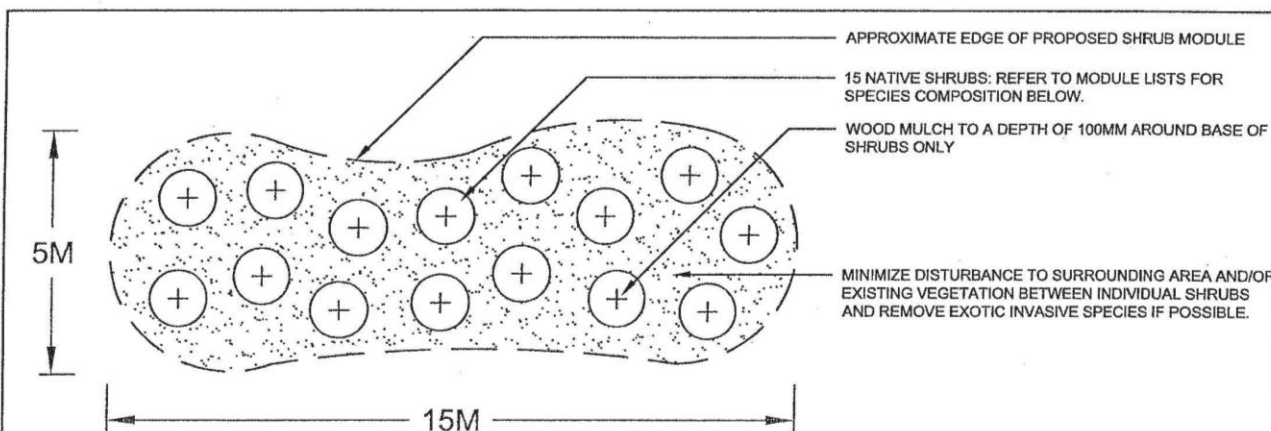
Typical Shrub Module Layout and Size (see notes below)
